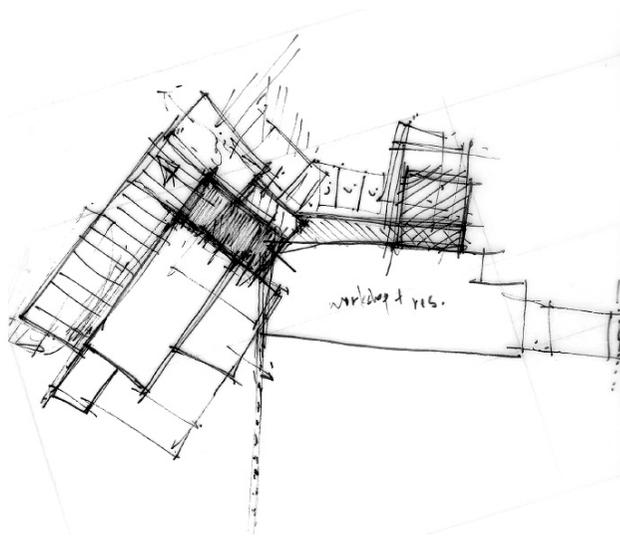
Floor planning, explores the relationship between interior and exterior. The plan needs breaking up along the north to bring more light in and encourage public connections
